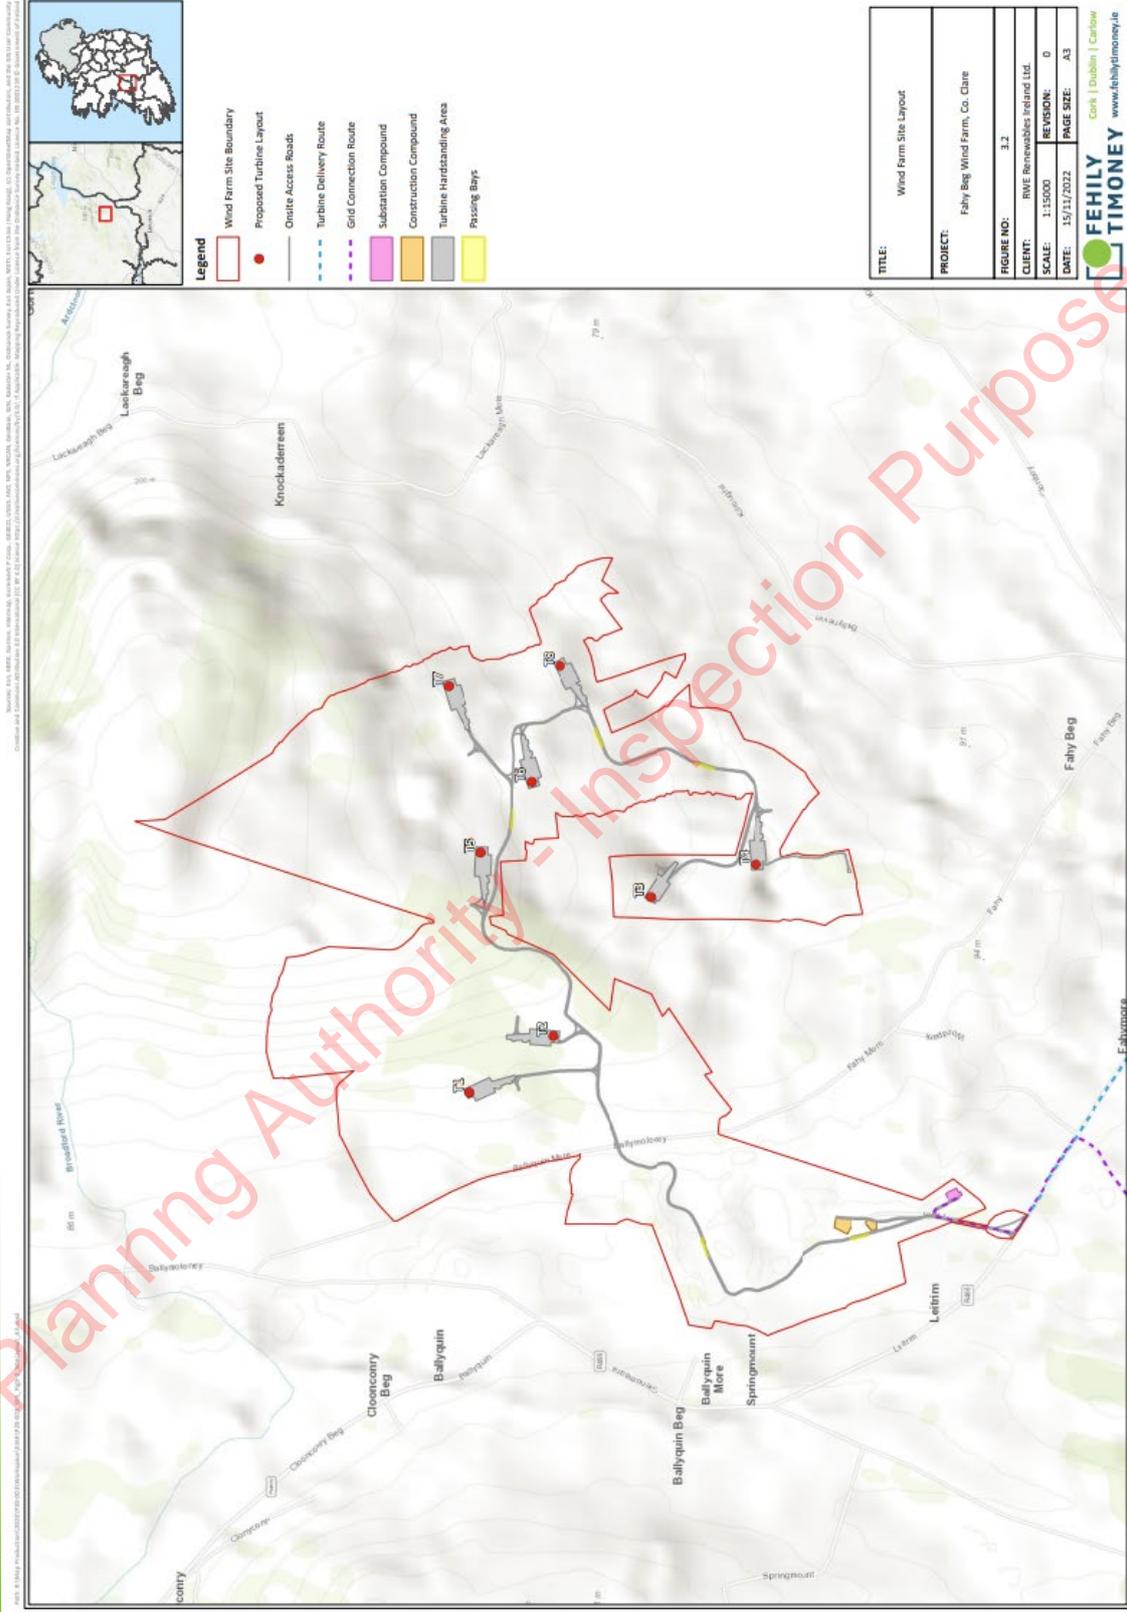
Design Iteration 3 - Layout Onsite Substation Location (November 2022)
